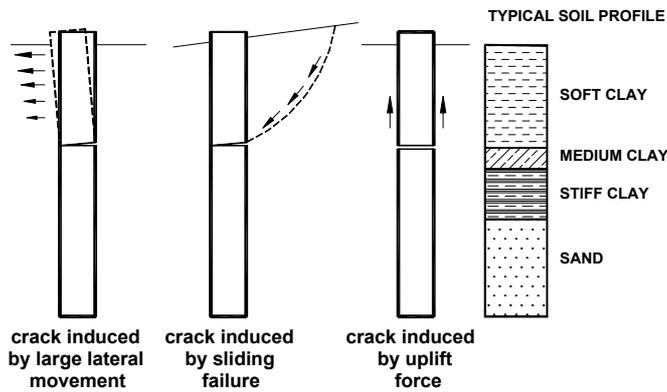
Typical features of external forces causing pile cracks in Bangkok subsoil
